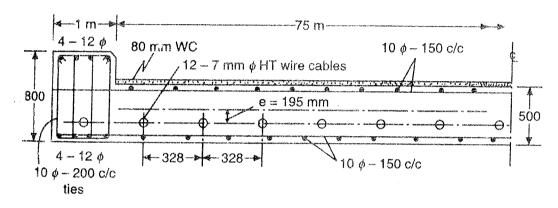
Cross Section of Deck Slab at Centre of Span.
